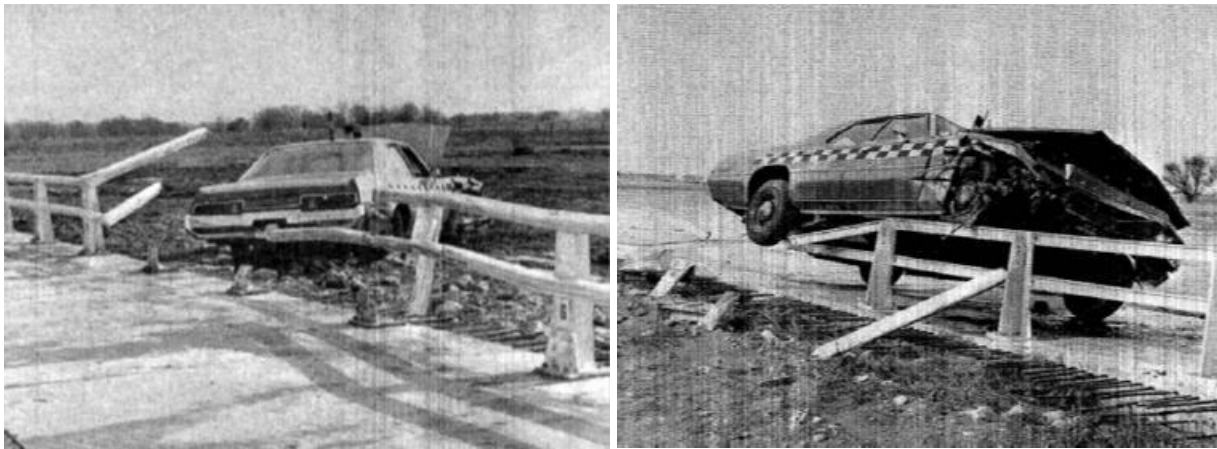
Failed Crash Test (TAC ATC 2010)
